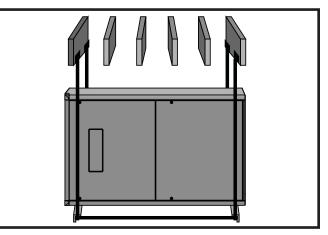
SC Horizontally Suspended in Attic or Crawl Space
